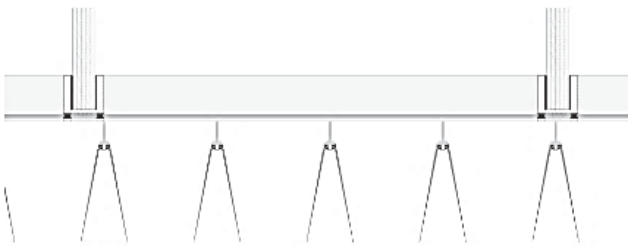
Interior view -façade open, “Frischholz”-Design [8]
